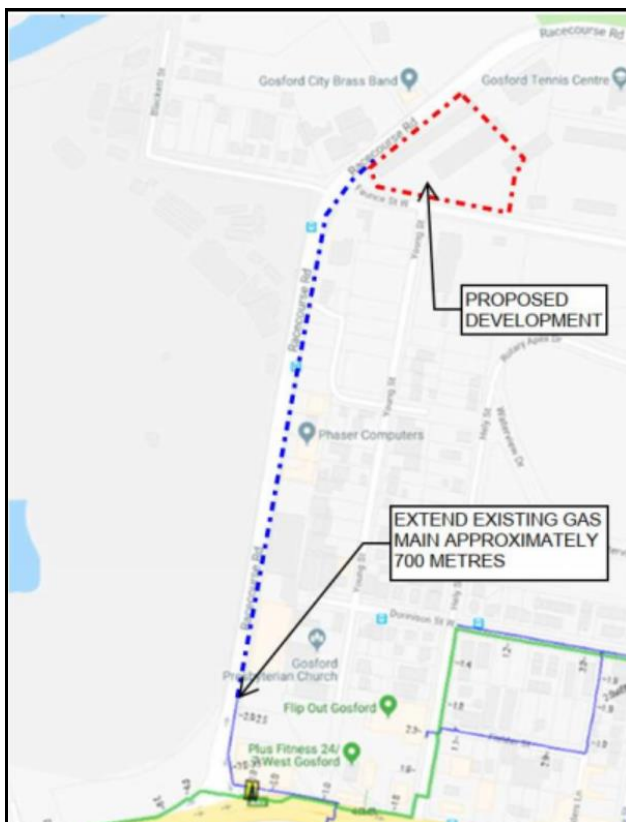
Proposed Jemena Gas Connection (WS+P, 2019)
